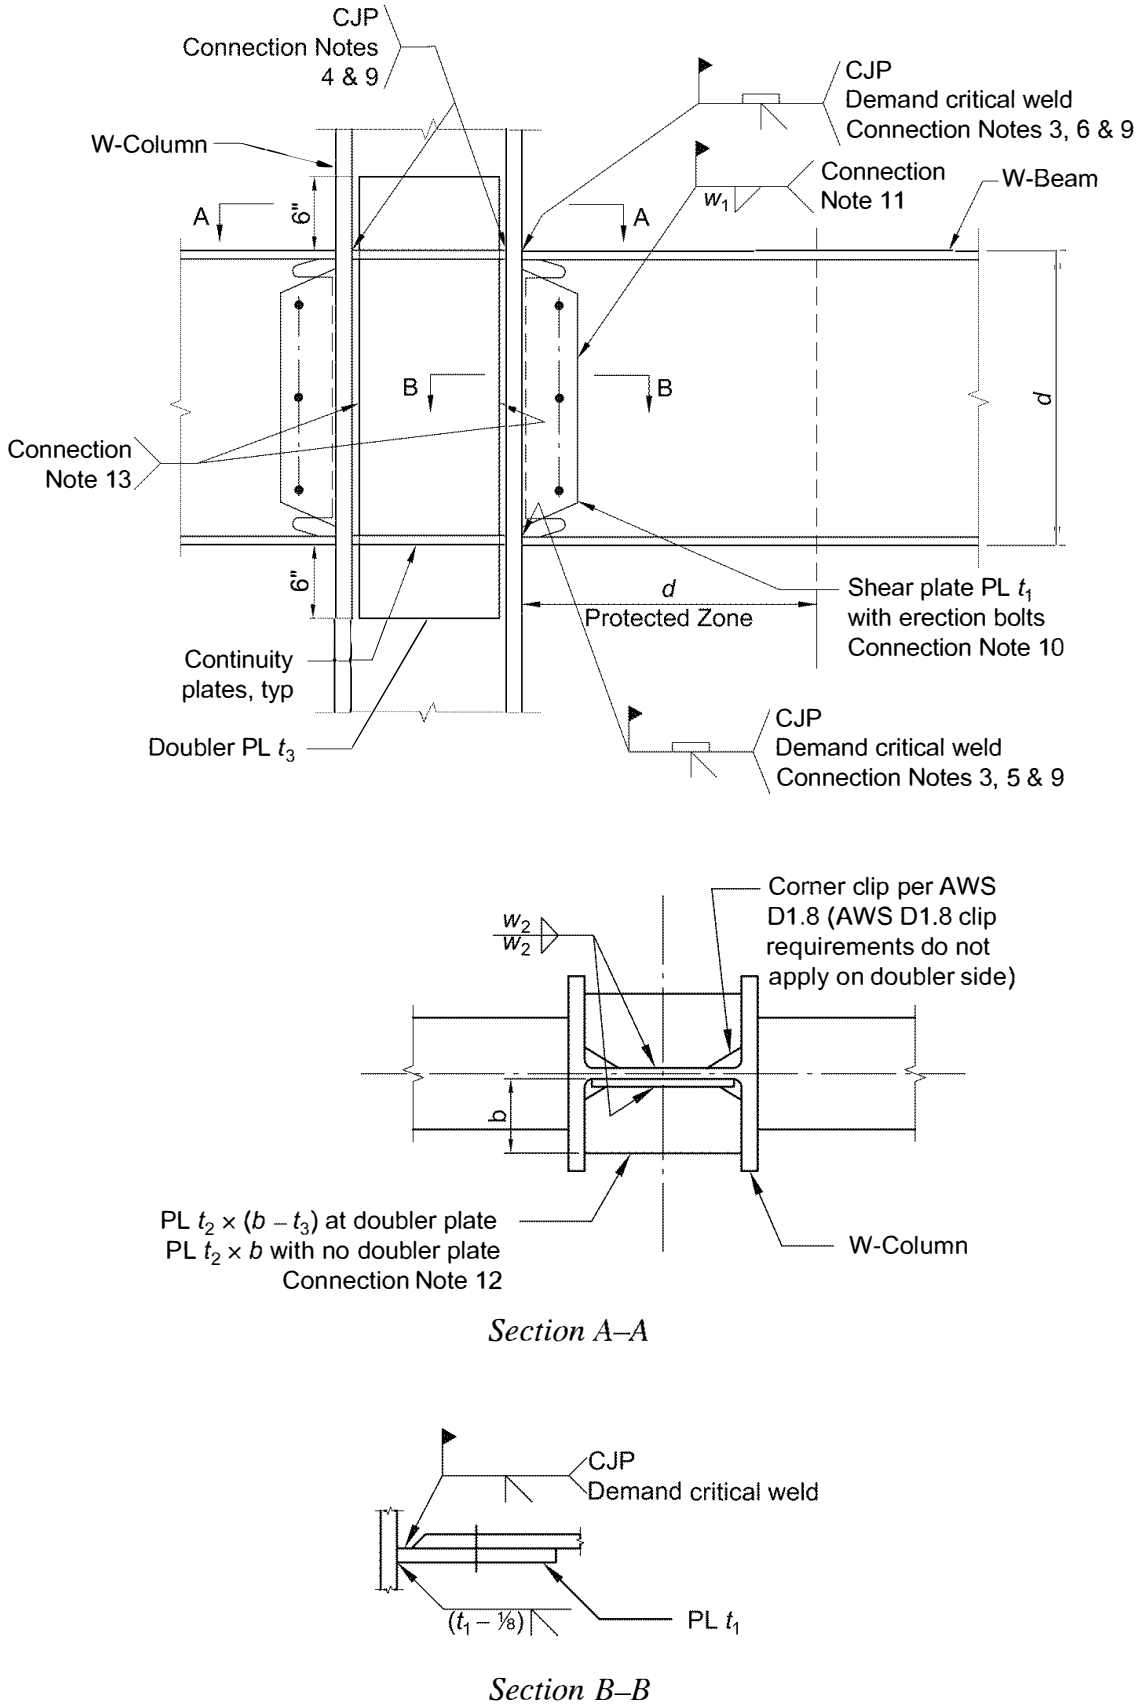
Beam-to-column special moment frame connection (WUF-W) as a sample connection detail.
